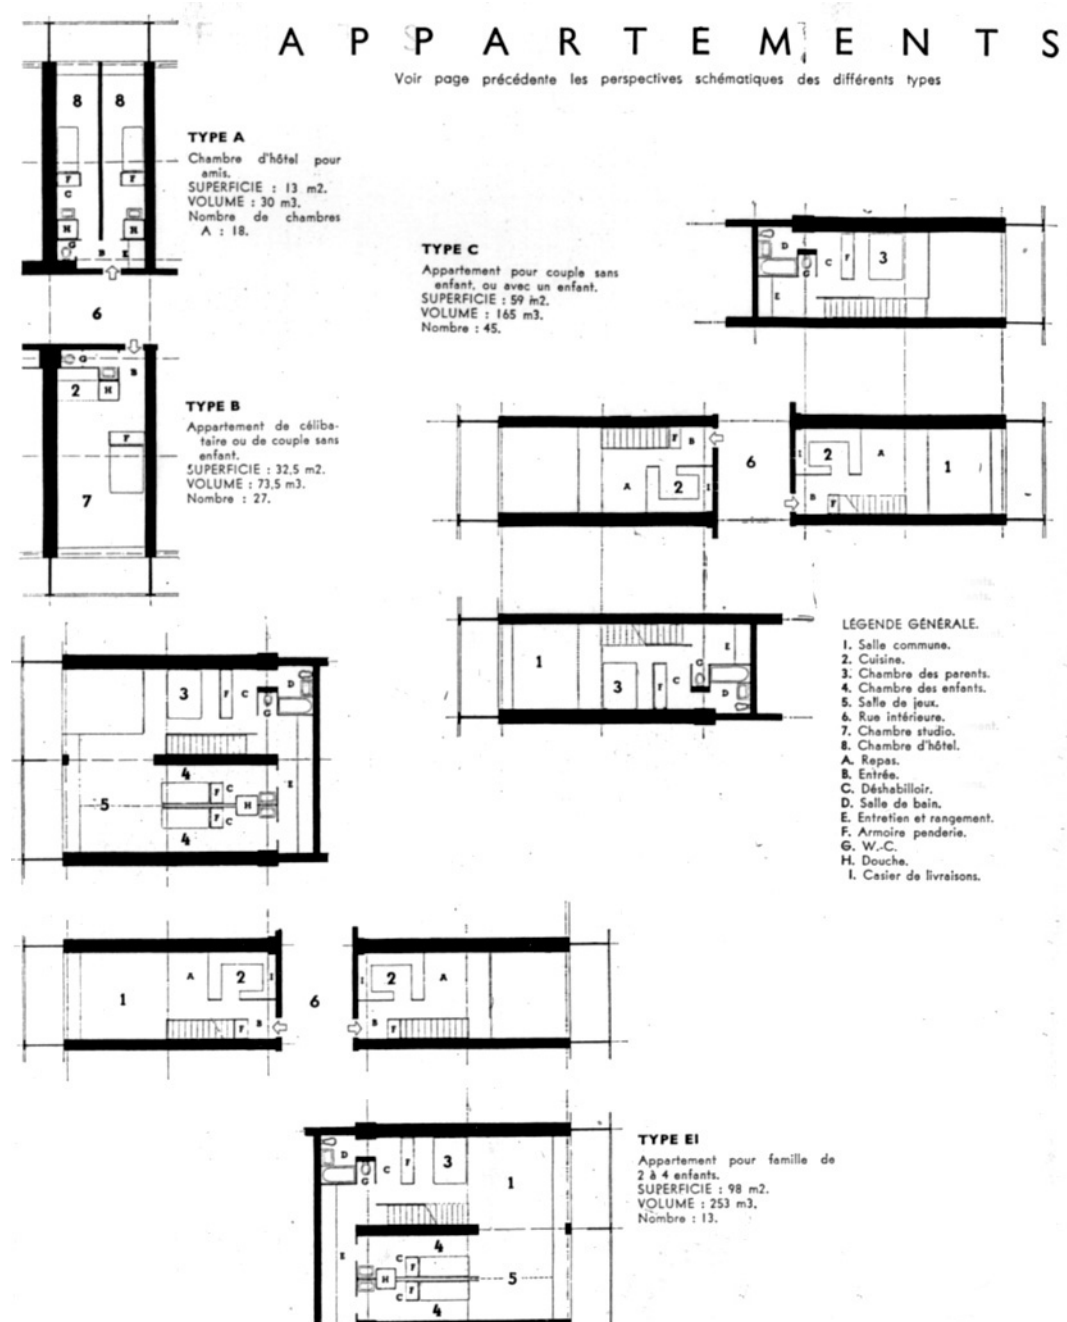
Unité d'Habitation, Marseilles, 1952, plan layout, some house types
